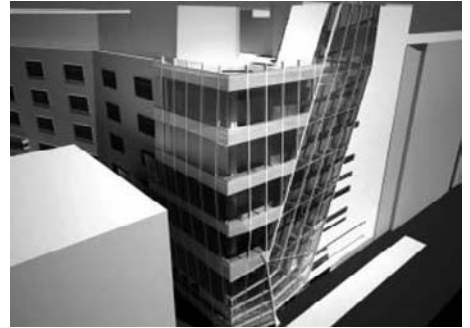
A new building for Great Ormond Street Hospital in London, approaching the construction phase, uses a double façade where expelled air from the building is passed between the outer walls to reduce the need for mechanical ventilation in the building. The outer glass expresses the direction of air movement in the thermal flue behind. Architect: Llewelyn Davies Yeang
